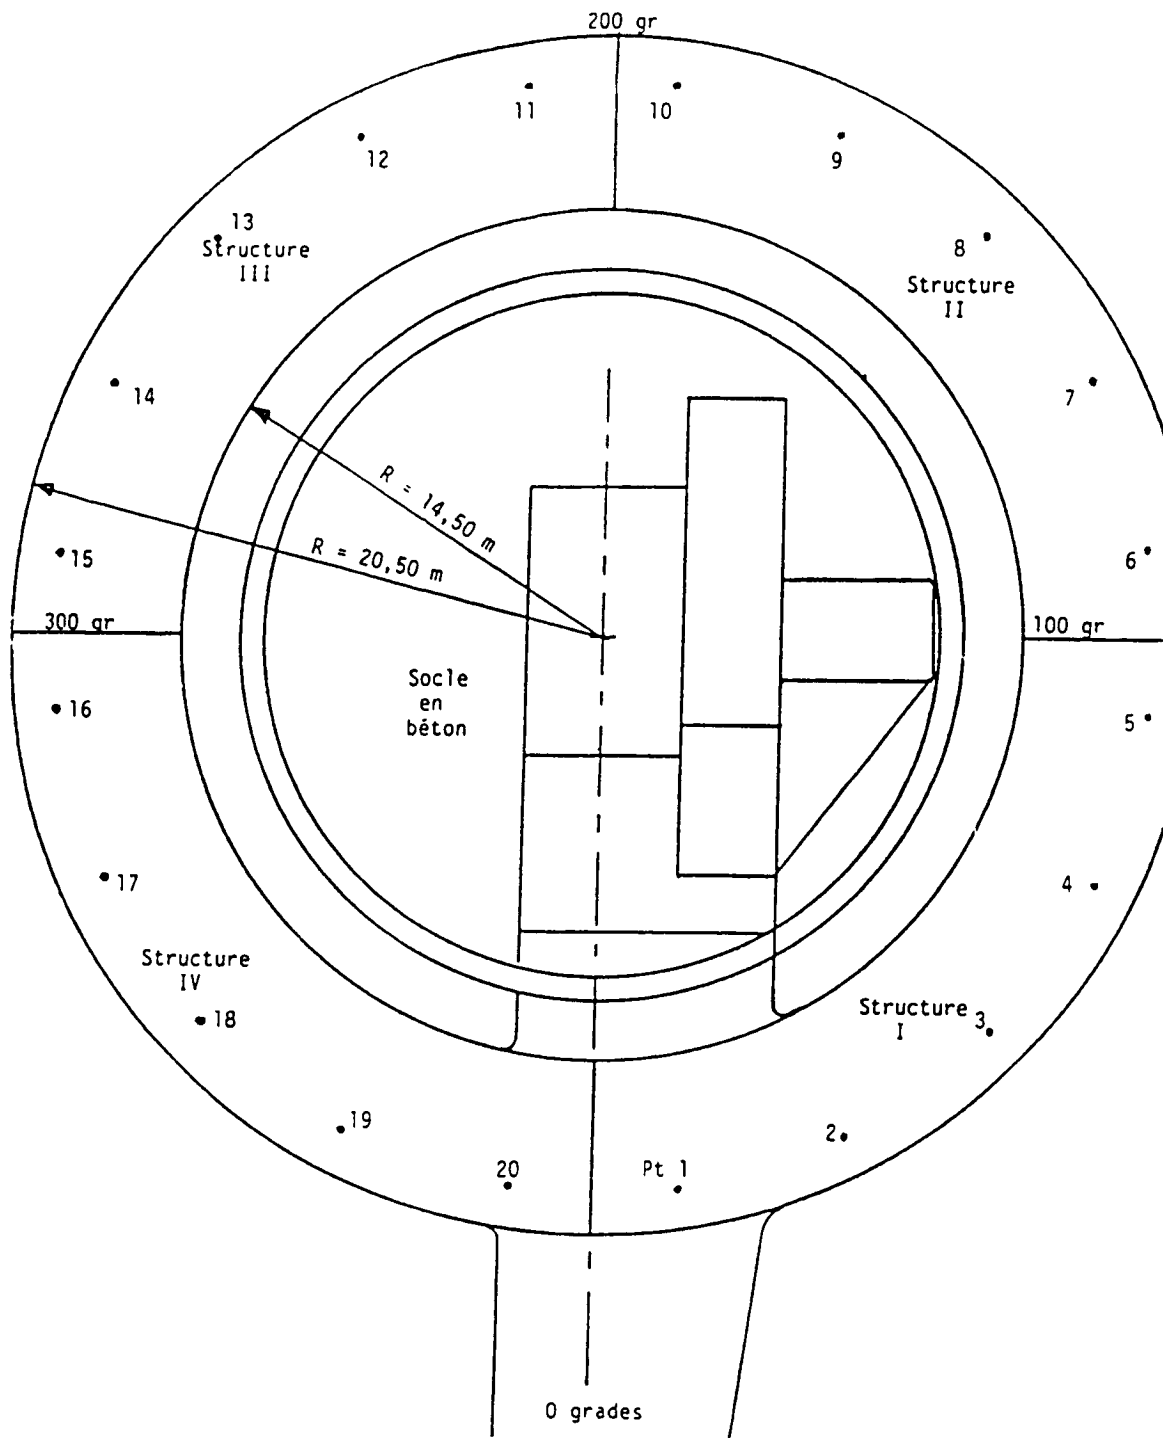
Test layout for pavement sections at Nantes wheel track facility
